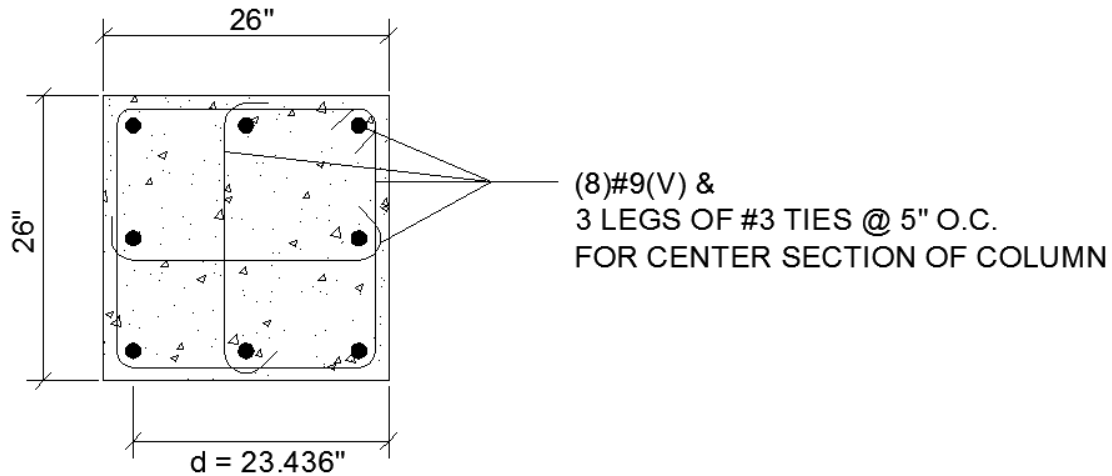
Exterior column, cross-section at center of column at the 2nd floor level based on tsunami design requirements.
